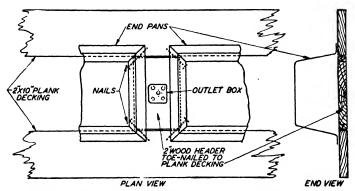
Method of Attaching Wood Header for Outlet Box Location Between Concrete Forms
